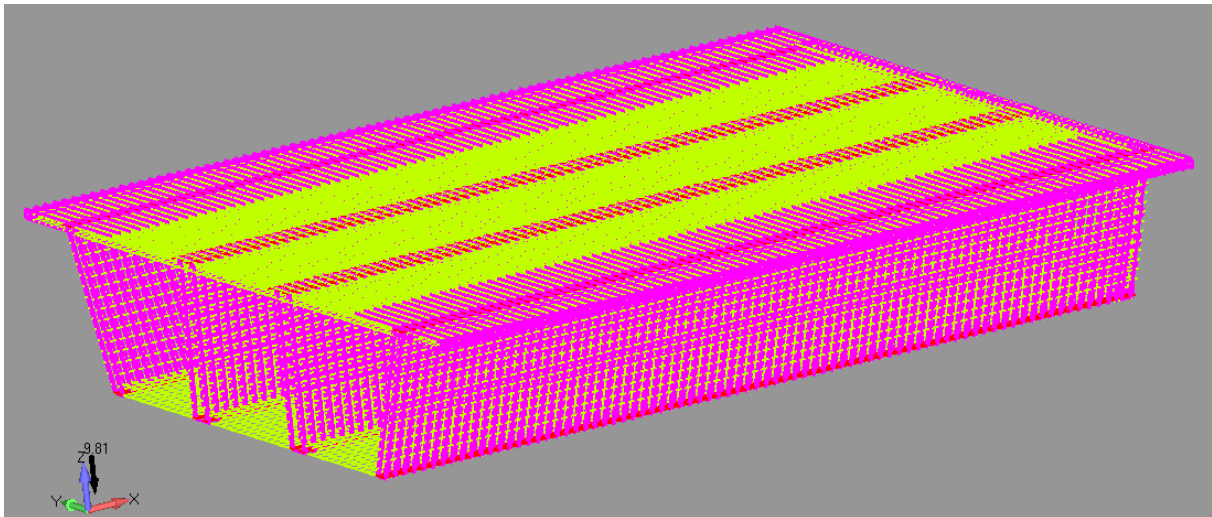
RC Bridge. Macro-element rebar mesh of the opening O7.
